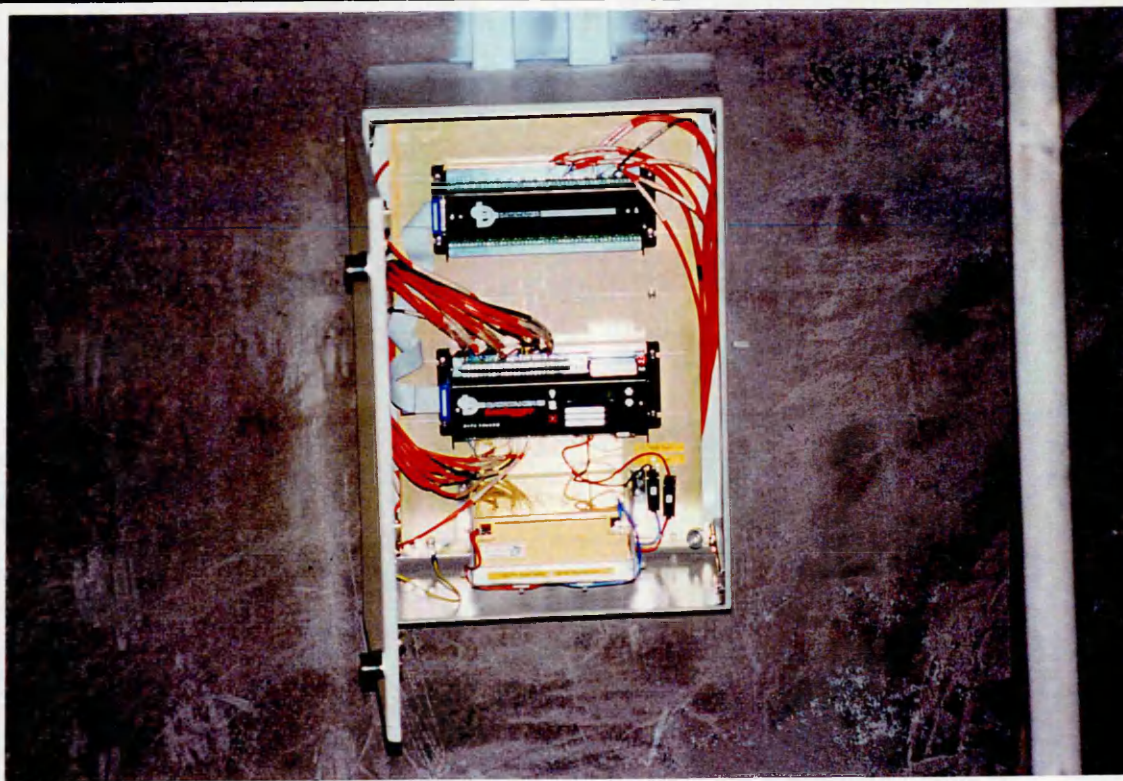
View of (from top) expansion module, data logger and 12 volt battery installed in a protective container on site (Location: Lawns Lane Bridge)
